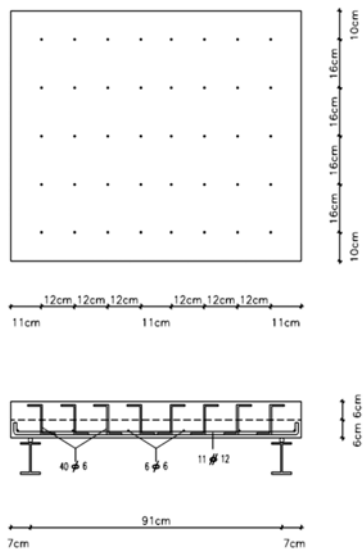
Typical dimensions and reinforcement of composite pre-slab (S21)
